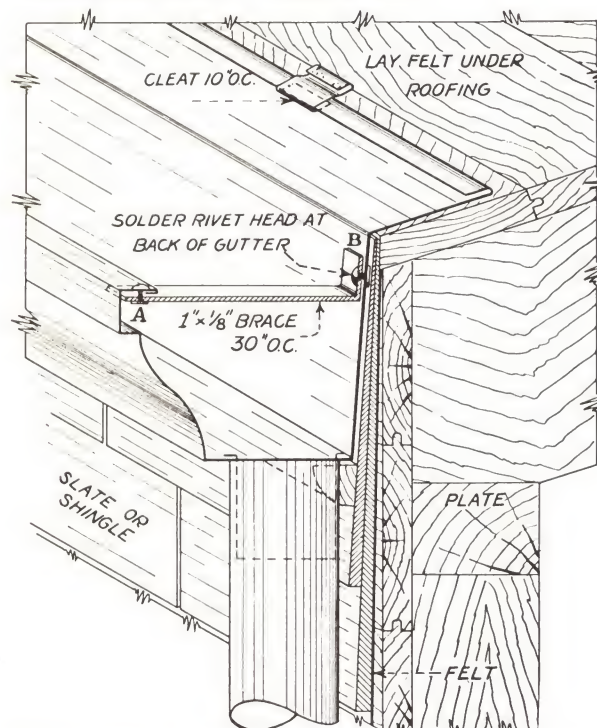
ANOTHER TYPE OF HANGING GUTTER FOR FLAT SEAM, STANDING SEAM AND BATTEN ROOF INSTALLATION SCALE 2"=1'-0"
